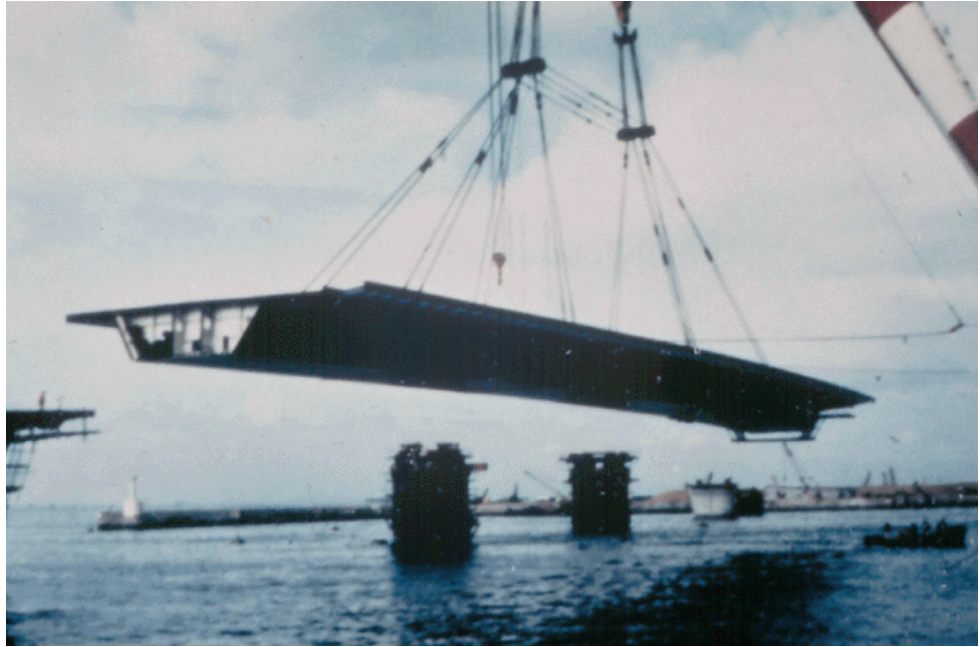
Span-by-span Total Span Erection (Lifting)
